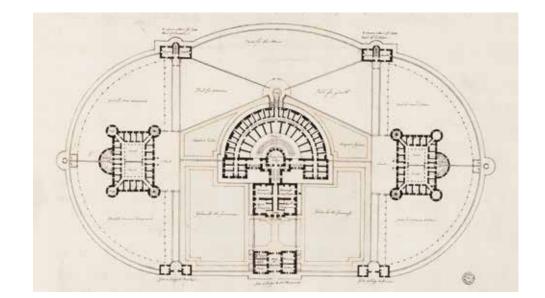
Robert Adam, Bridewell Design: Castle Style 2-Plan, 1791.
